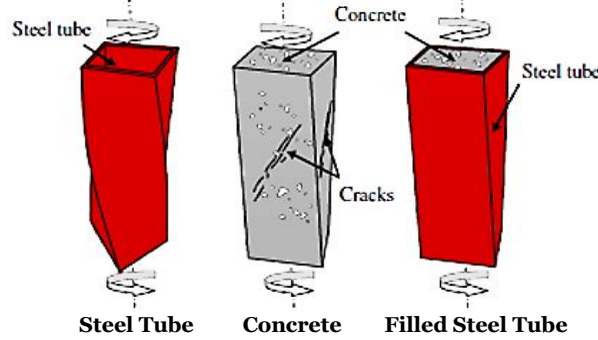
Schematic Failure Modes of Steel Tube, Concrete, and CFST under Torsion.
